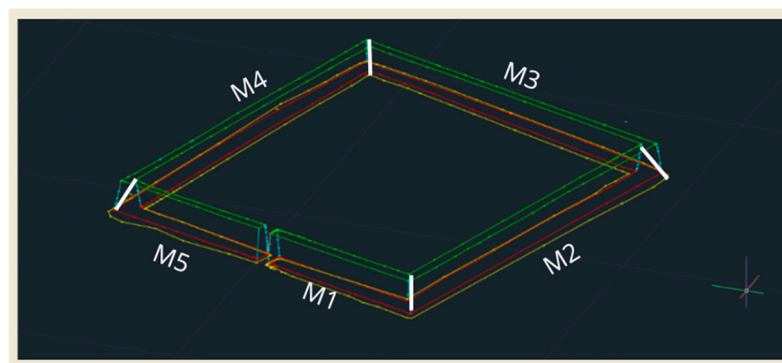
Perimetral wall points taken by Total Station. Walls sectioned and named to apply ontology parameters.
